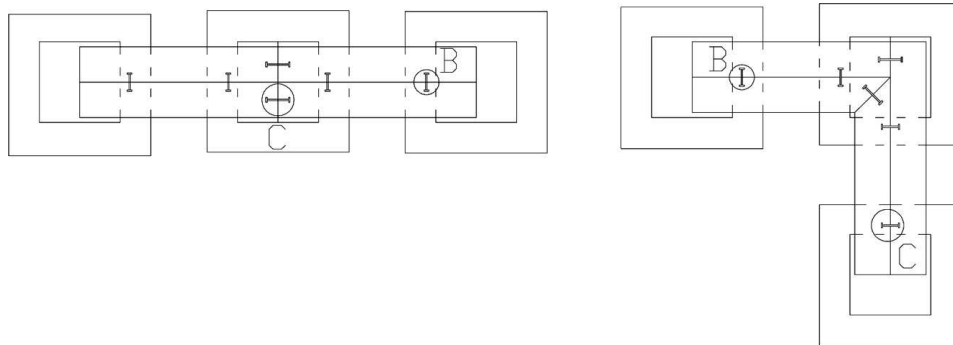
Plan view of the two configurations of the columns and the positioning of the clamps B and C
